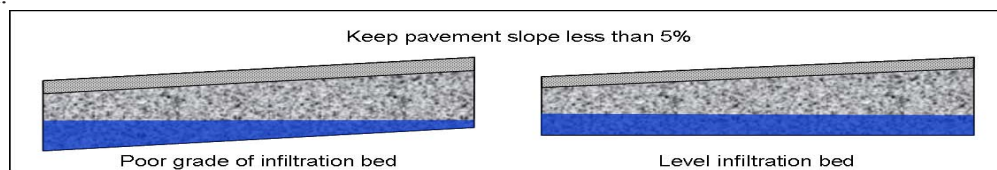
A level infiltration bed and limited pavement slope will maximize stormwater treatment and storage.
